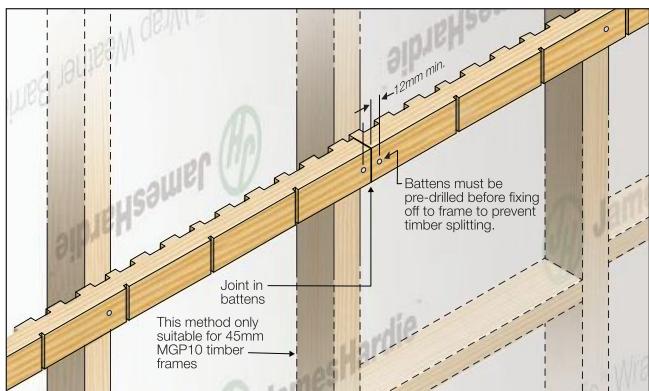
ON-STUD JOINTING OF BATTEN ON 45MM TIMBER FRAMES
